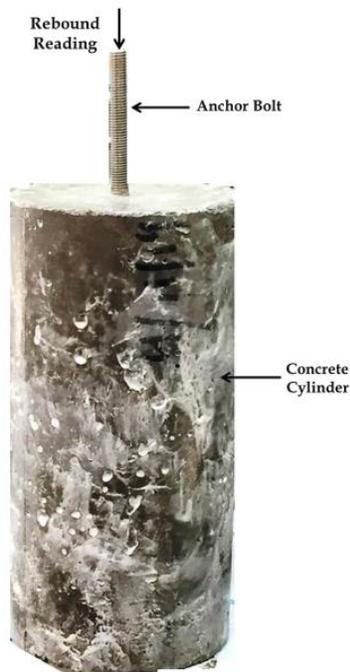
A view of a concrete cylinder with an embedded anchor bolt [4].
